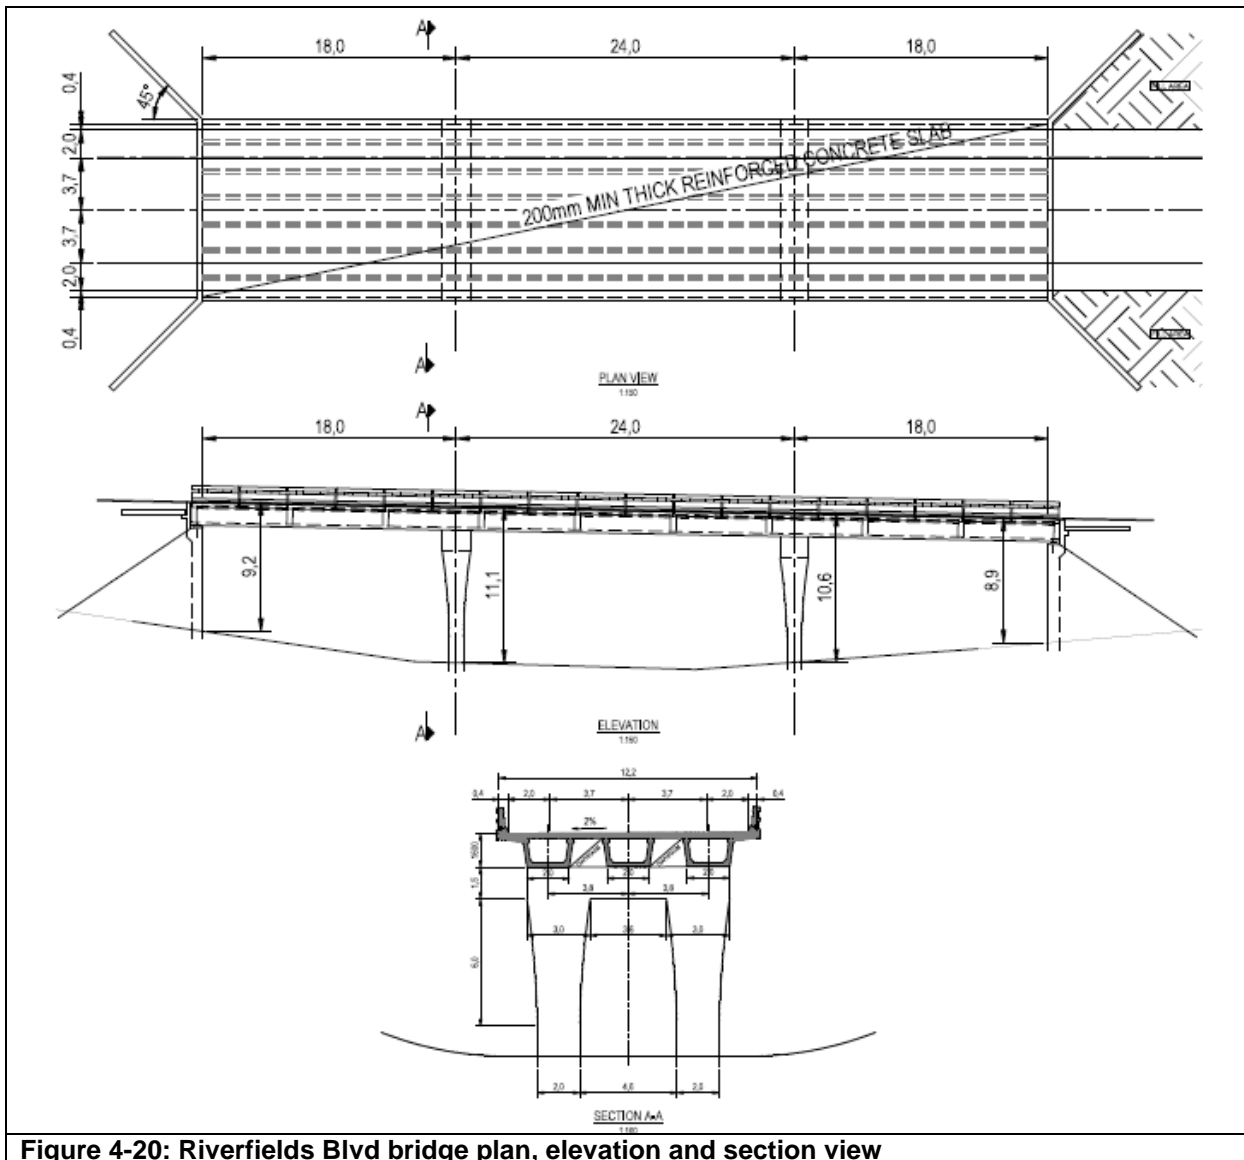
Riverfields Blvd bridge plan, elevation and section view
